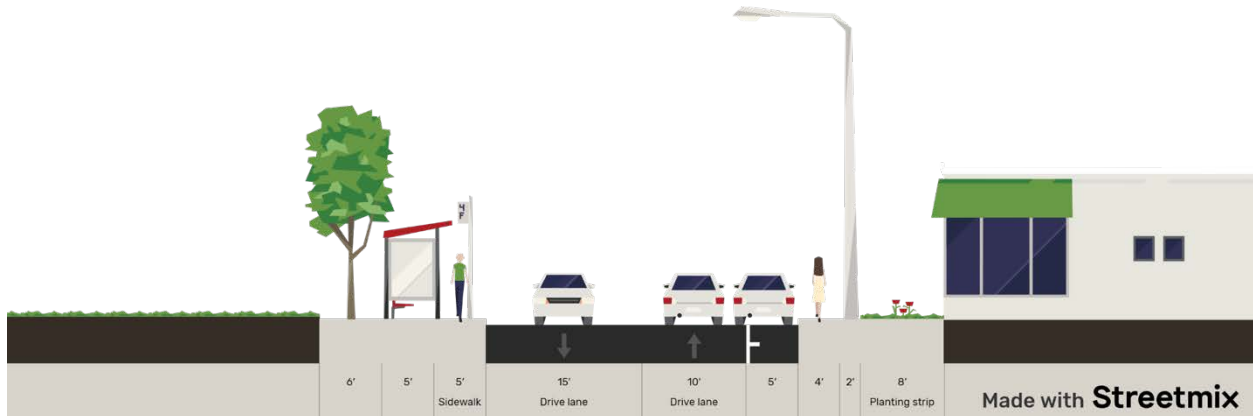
The cross-section of Carroll Street, looking north from Winburn Street. Note the sheltered bus stop and narrow sidewalks on each side. There are no painted parking strips, but all vehicles were observed parking on the east side of the street. Diagram created in Streetmix by EC, 2022.
